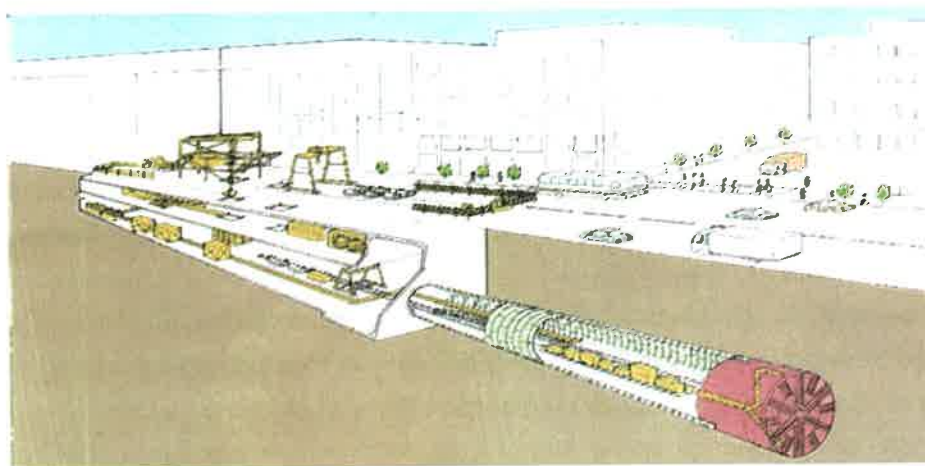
TBM (Tunnel Boring Machine) construction method between stations
